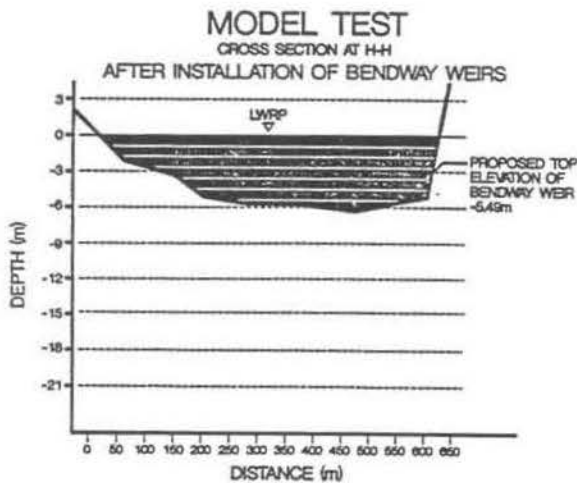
Cross-sectional plot of bendway weir plan at H-H
